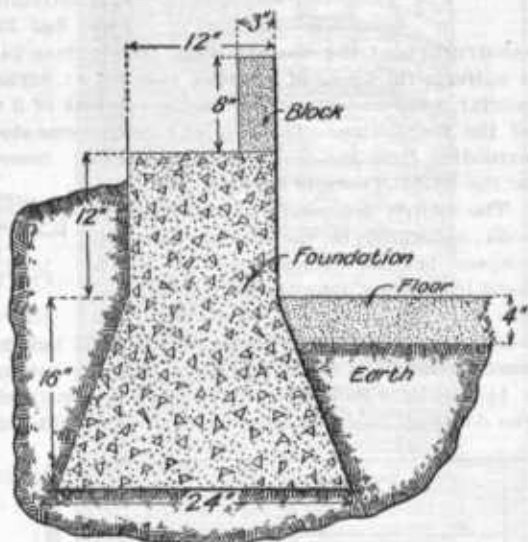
Section of foundation and floor of thin solid-block silo.
